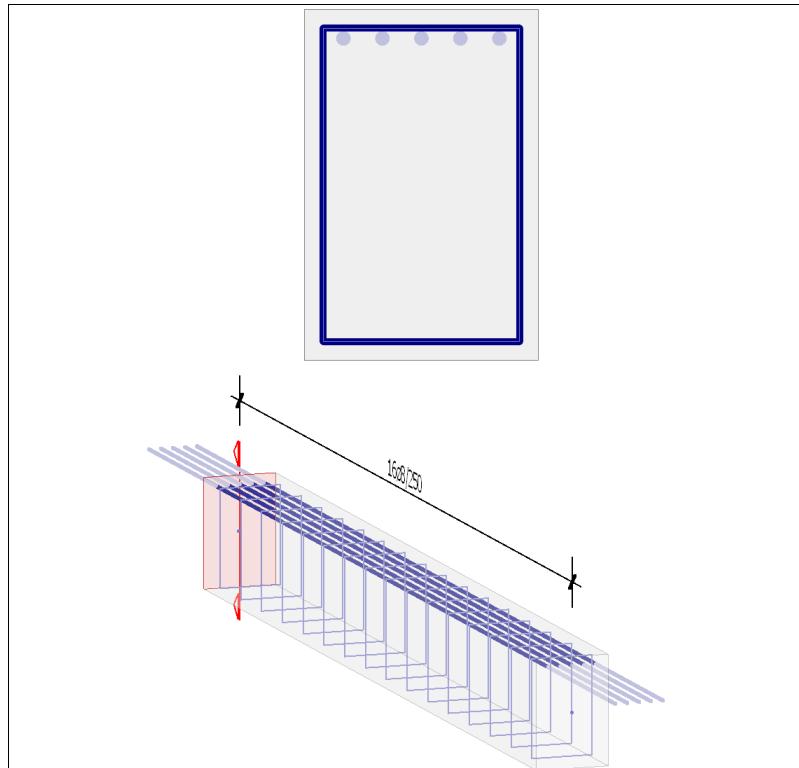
The cross section of the RC cantilever in FEM-Design
